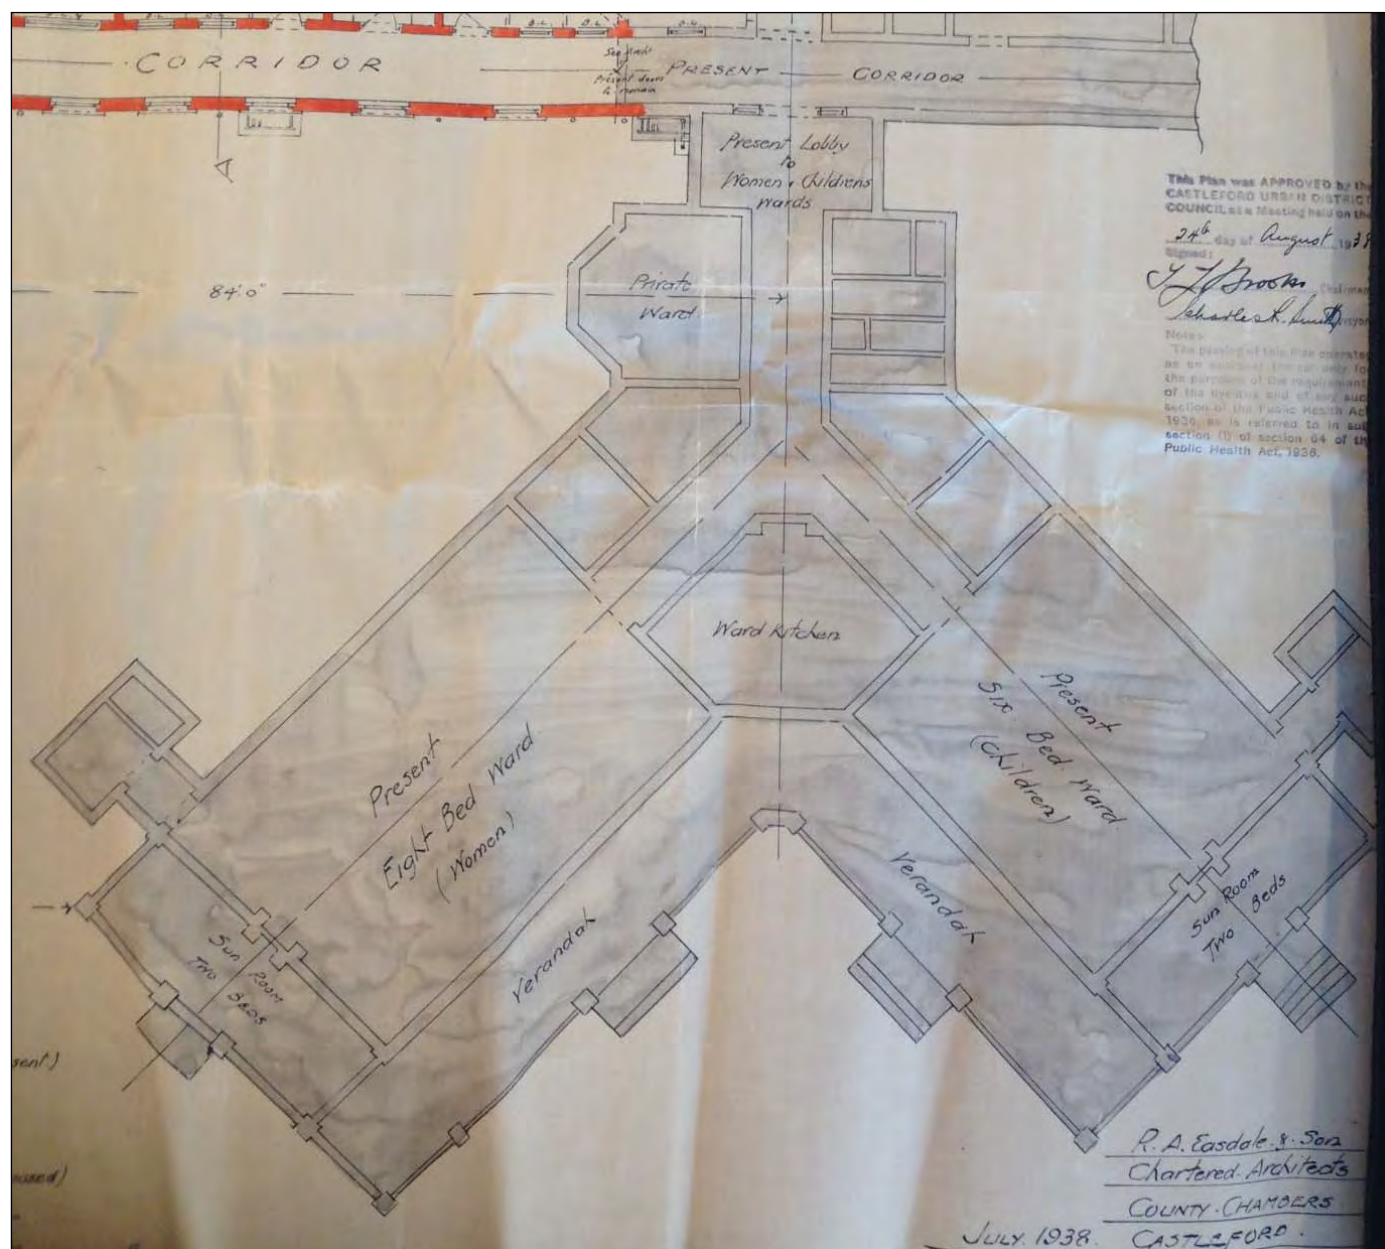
West wards of original building at ground-floor level (WYAS: Wakefield WMT/CA/4171, plan 1).
